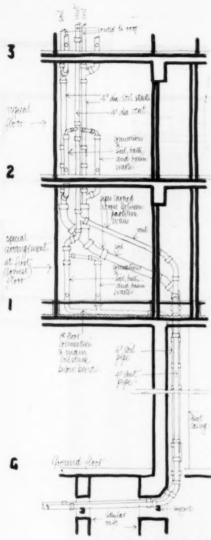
Pipes at first floor arranged so as to obtain easy bends. First-floor connections are made to separate pipes taken into main stack at low level, as shown in Fig. 3
